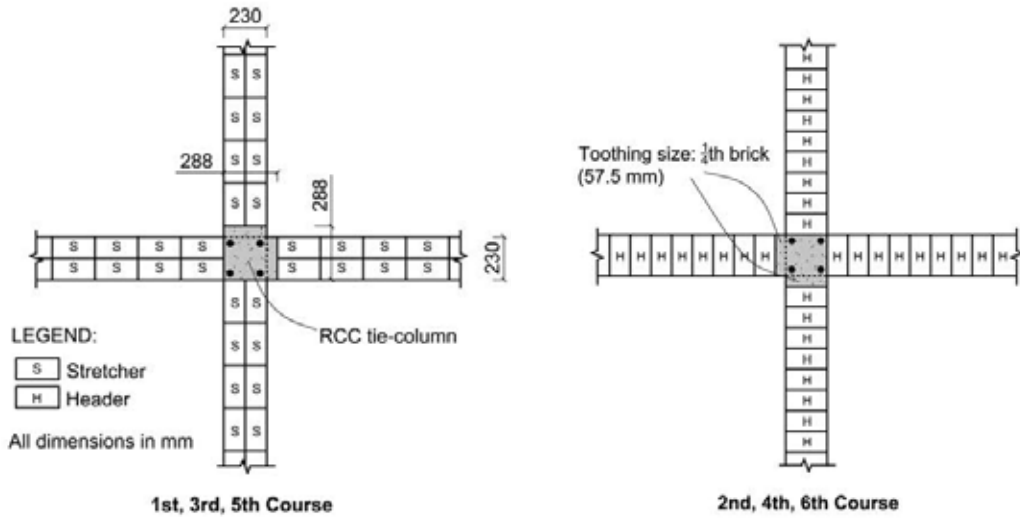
Locations of RC tie-columns and masonry wall layout at a cross wall intersection: construction specification.
